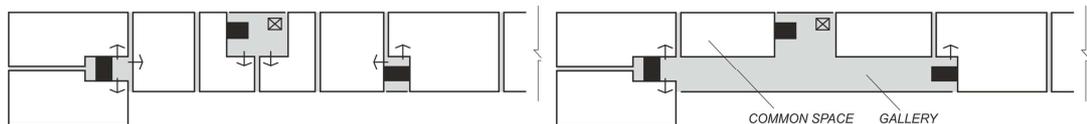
Apartment and floor diagrams, re-drawn by the author (Source: Roger Montgomery, “Comment on: “Fear and House-as-Haven in the Lower Class.””*Journal of the American Institute of Planners* (January 1966))
